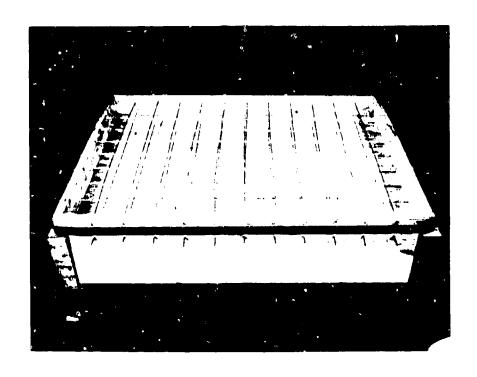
FABRICATION MOLD FOR REINFORCED CONCRETE PANELS
